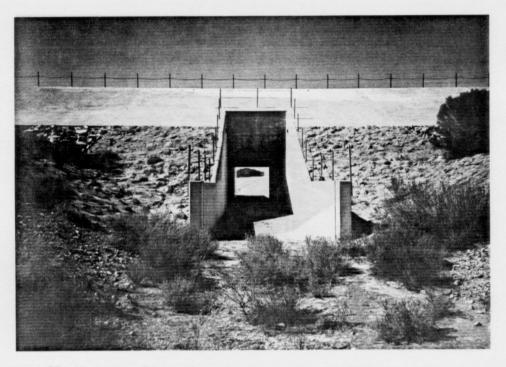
Flood Control Outlet Works Conduit (view from approach channel, looking downstream).
